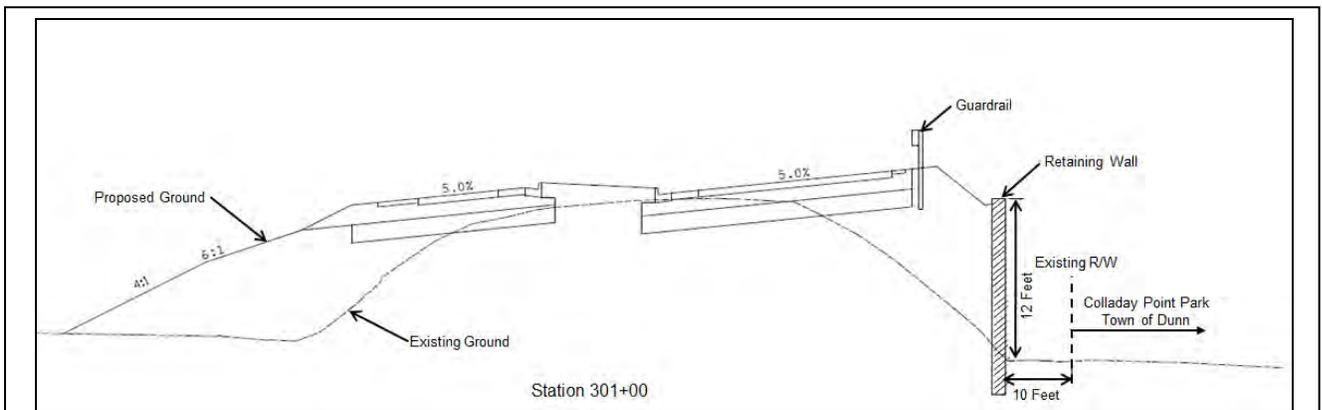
US 51 Cross Section Adjacent to Colladay Point Park
